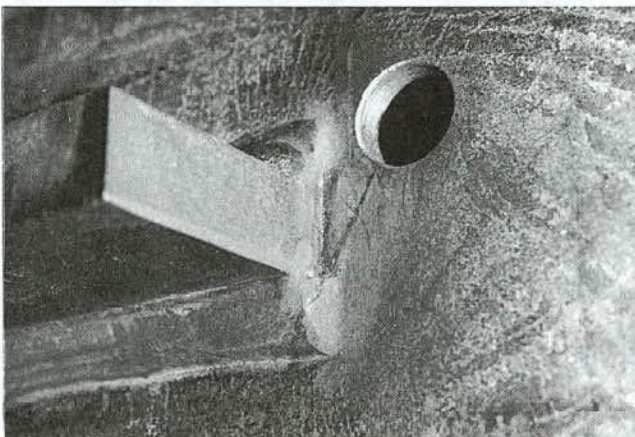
Retrofit hole at top end of crack at detail 12, Beam 3W.
